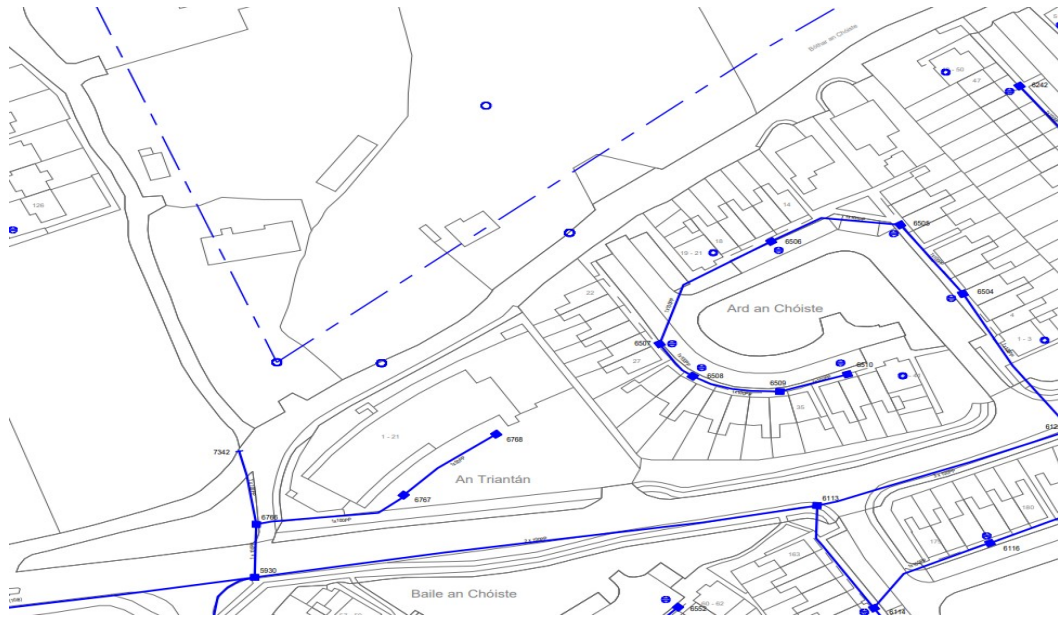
ESB Record Drawing that indicates no overhead cable diversions required.
